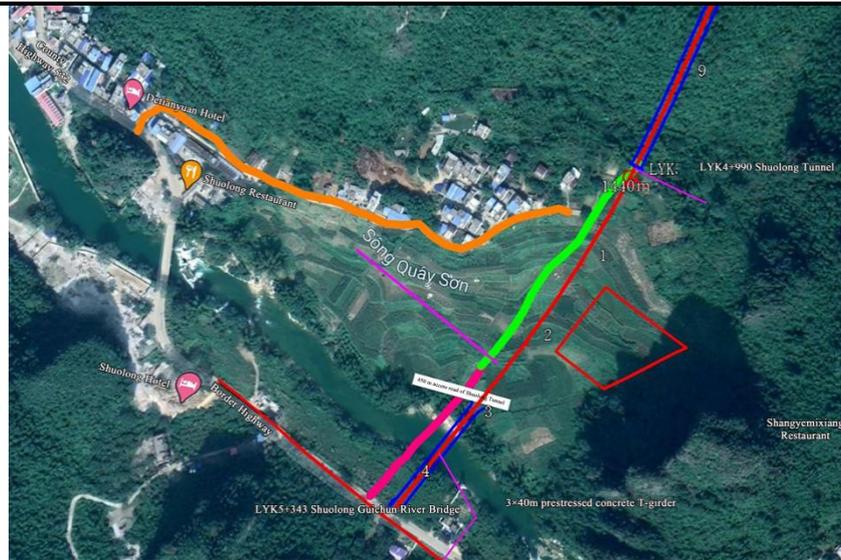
Location of New Access Road to Exit of Shuolong Tunnel and Trestle of Shuolong Guichun River Medium Bridge
